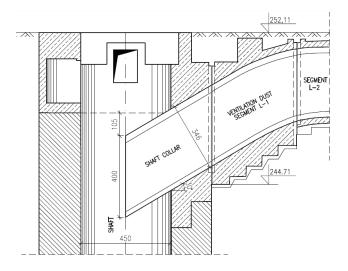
Longitudinal section drawing of the ventilation duct and shaft collar
